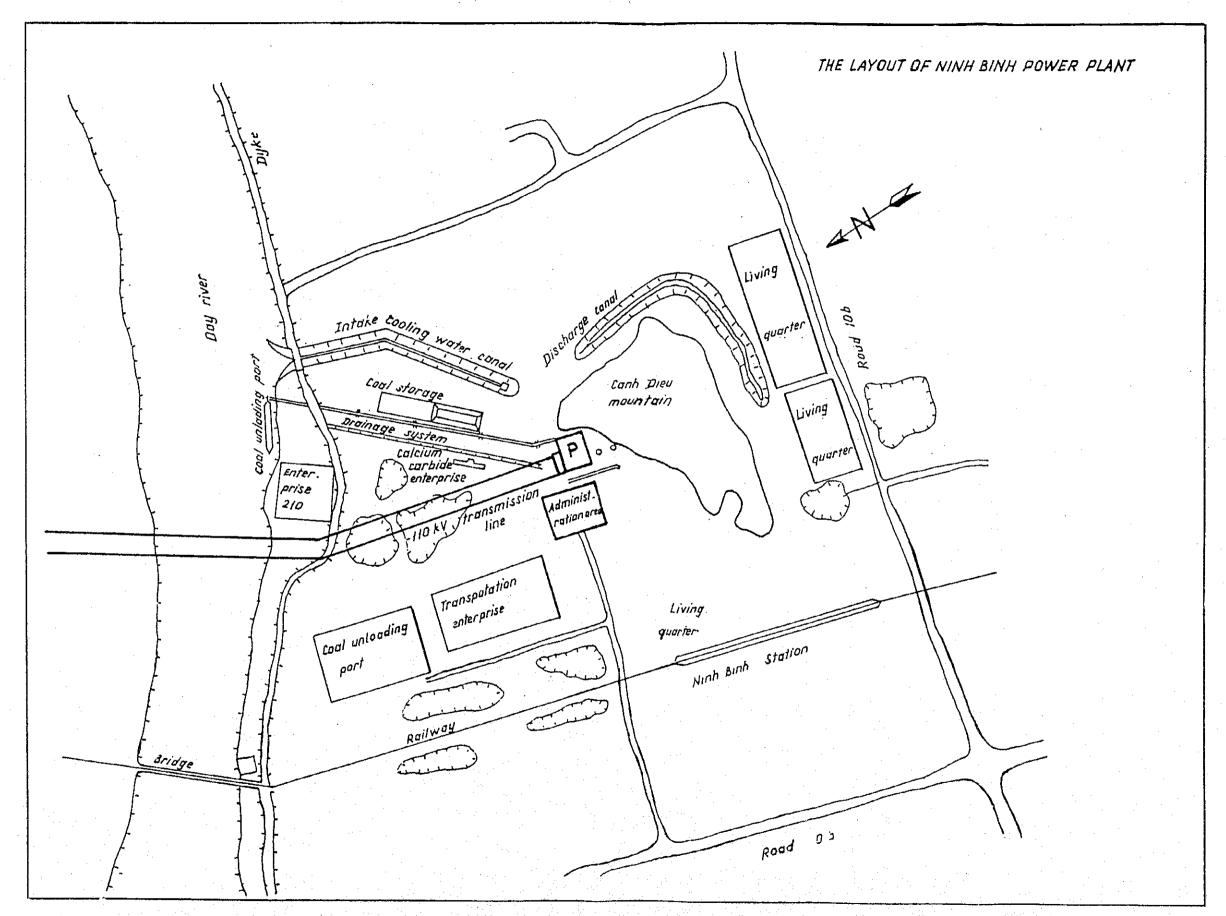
The Layout of Ninh Binh T.P. Station
